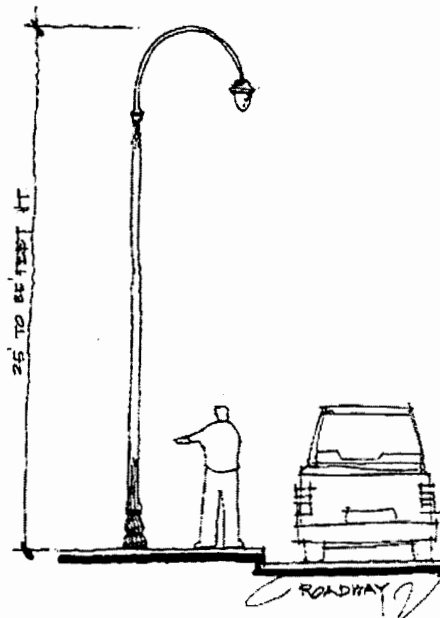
Lighting for street traffic and pedestrian walkway combined
